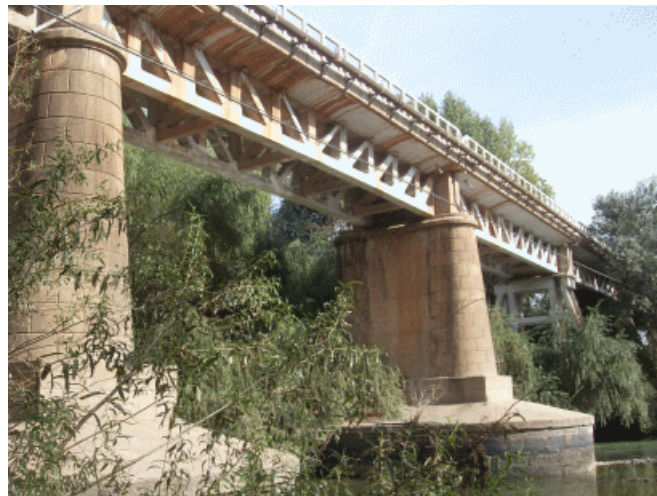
Bridge over the Guadalquivir River in Villanueva de la Reina (Jaén), with 12 Straight Sections of Triangulated Beams of Steel-reinforced Concrete of 20-m Spans Each, over Piers of Masonry and Paling Fences of Reinforced Concrete, 1929
